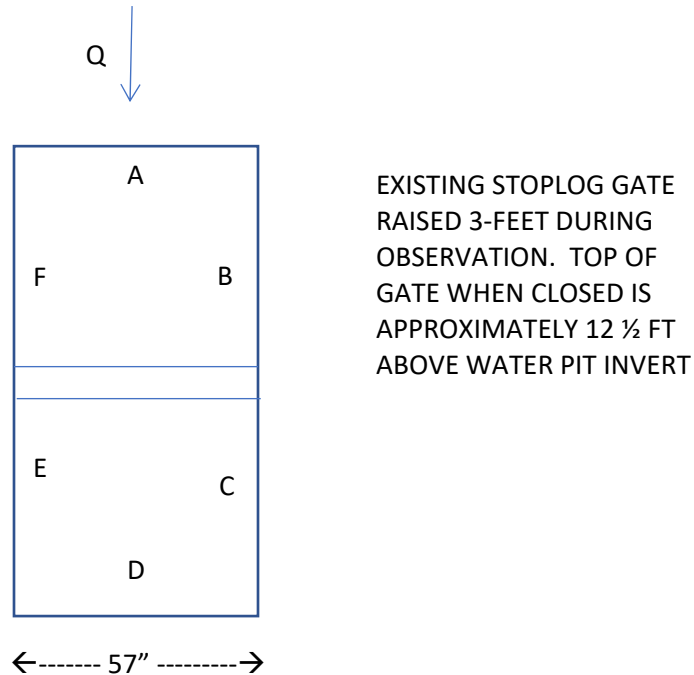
Ashuelot Pond Dam Gate House plan view wall designation
